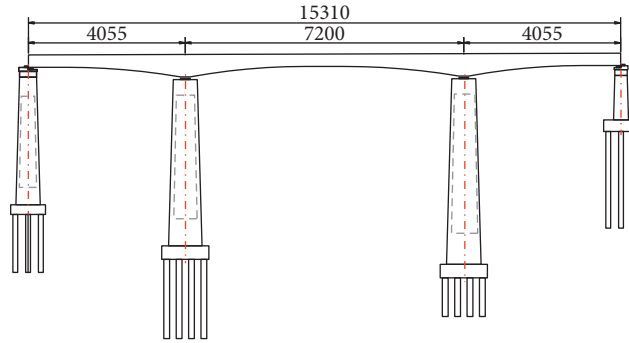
Bridge span arrangement of the prototype (unit: cm).
